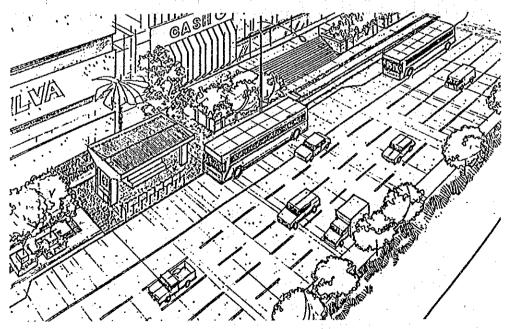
Improvement Plan of 6a and 7a Ave.
